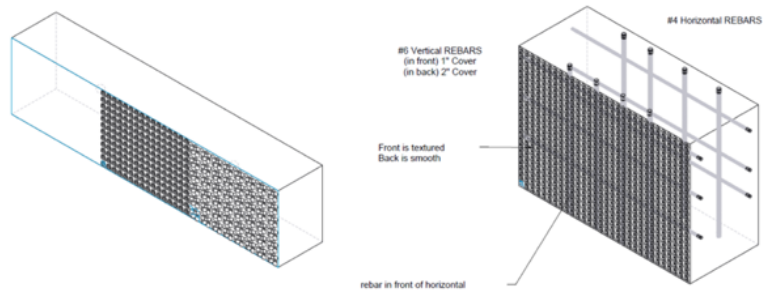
Concrete Beam (left) and Form (right) Design with varying surface textures and rebar
